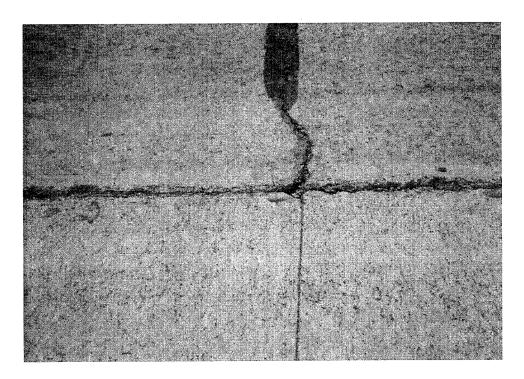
Sealed crack (Lane I) opposite a transverse joint (Lane II)
